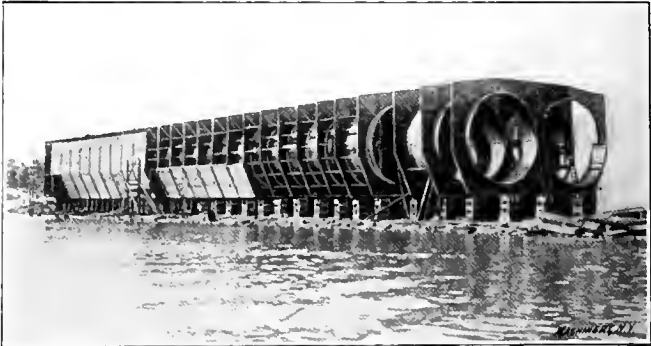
Section of Tunnel in St. Clair Shipyard, showing Diaphragm Construction.
